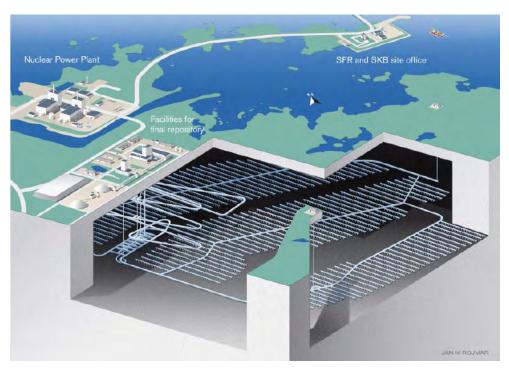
Illustration of a possible layout of facilities for the final repository. The layout of the underground part of the facility is according to Layout 1 (from SKB).
